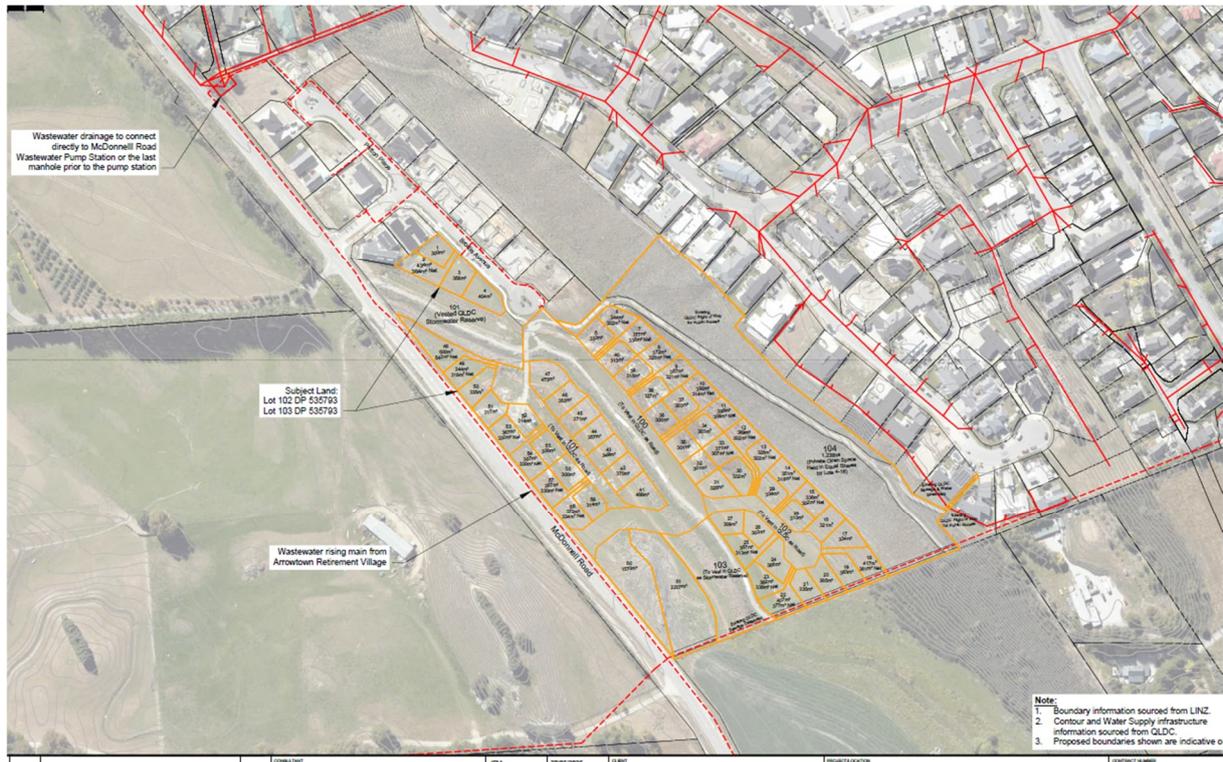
McDonnell Road development plans showing proposed wastewater network connections.
